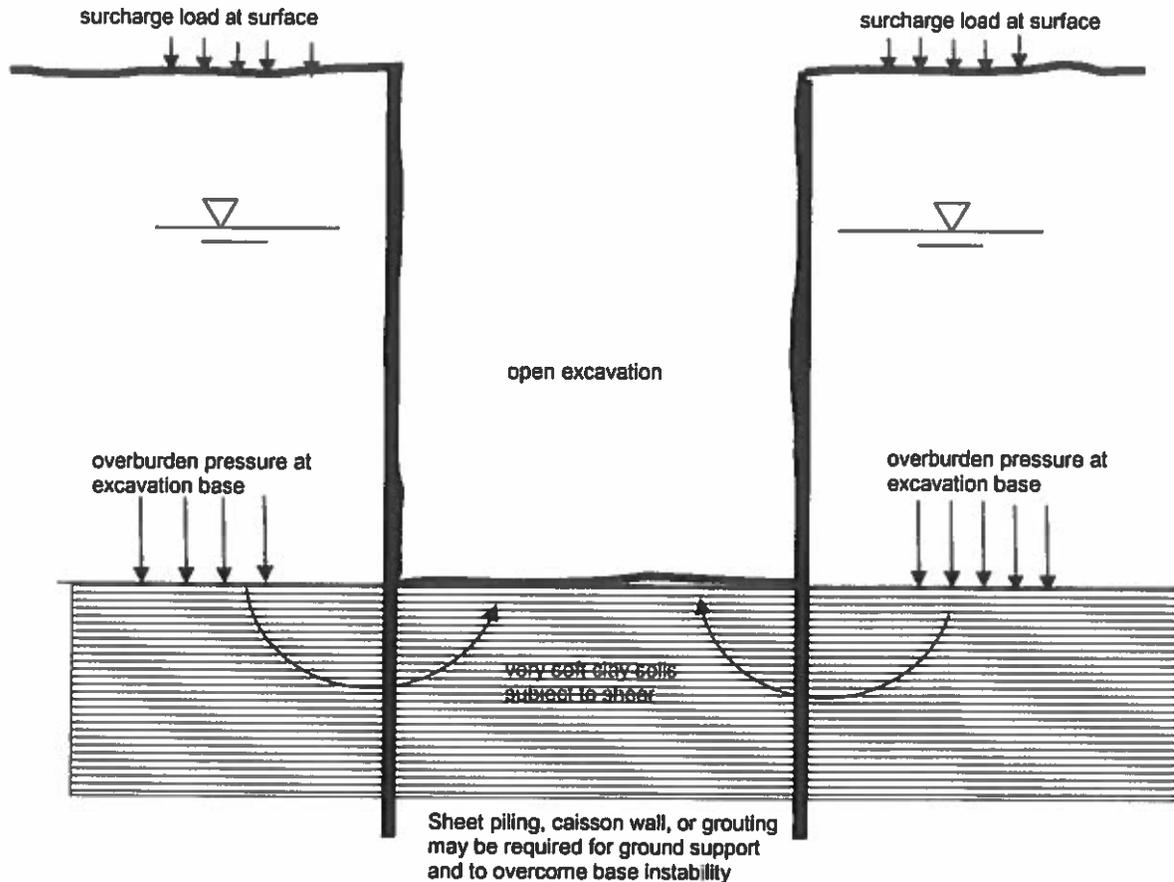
Illustration of Potential Excavation Base Heave Shear Failure
